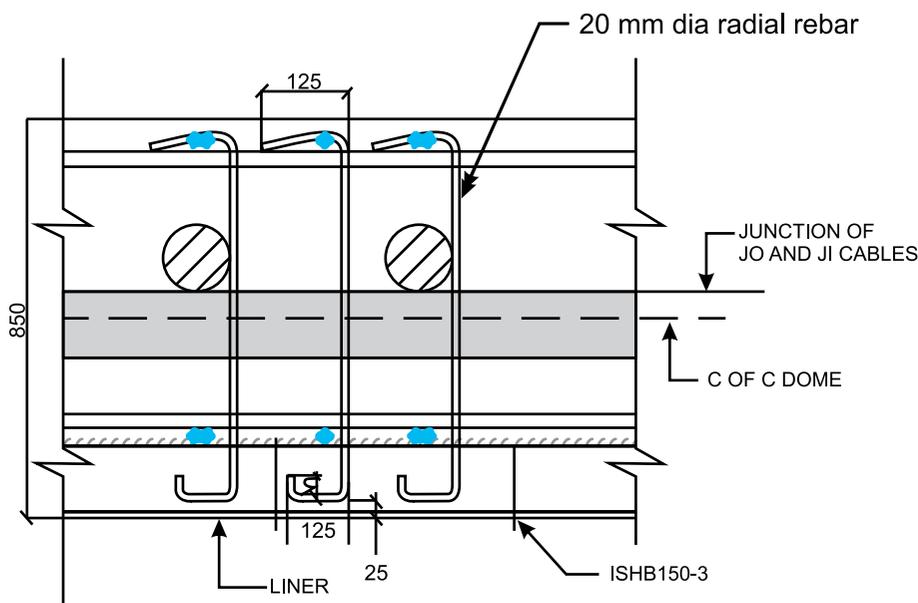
Arrangement of radial reinforcement at a typical liner backing member-concrete interface
